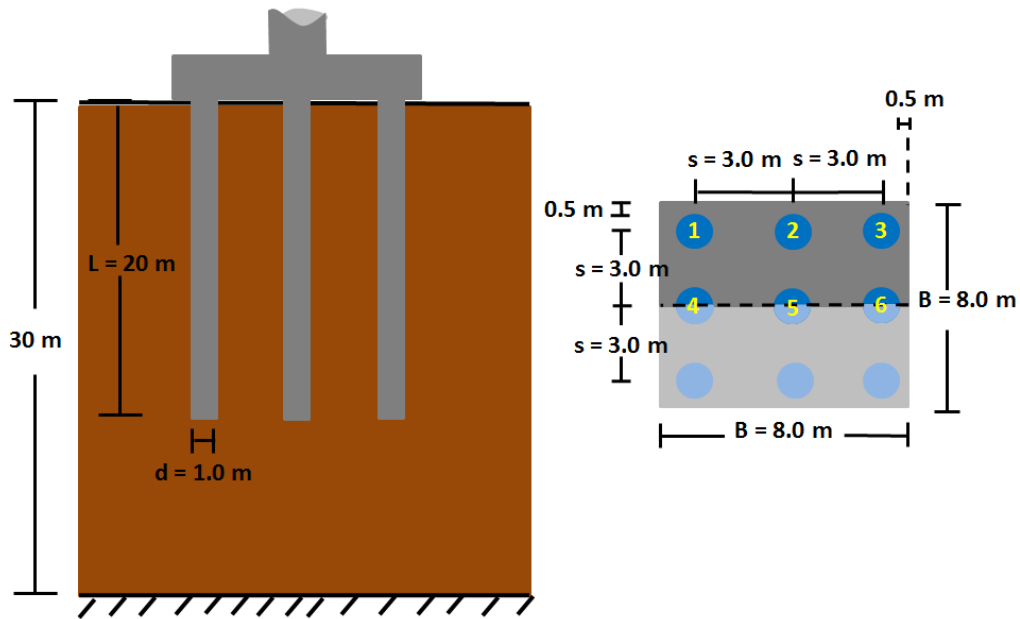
Final configuration of the conventional pile foundation. Section and plan view.
